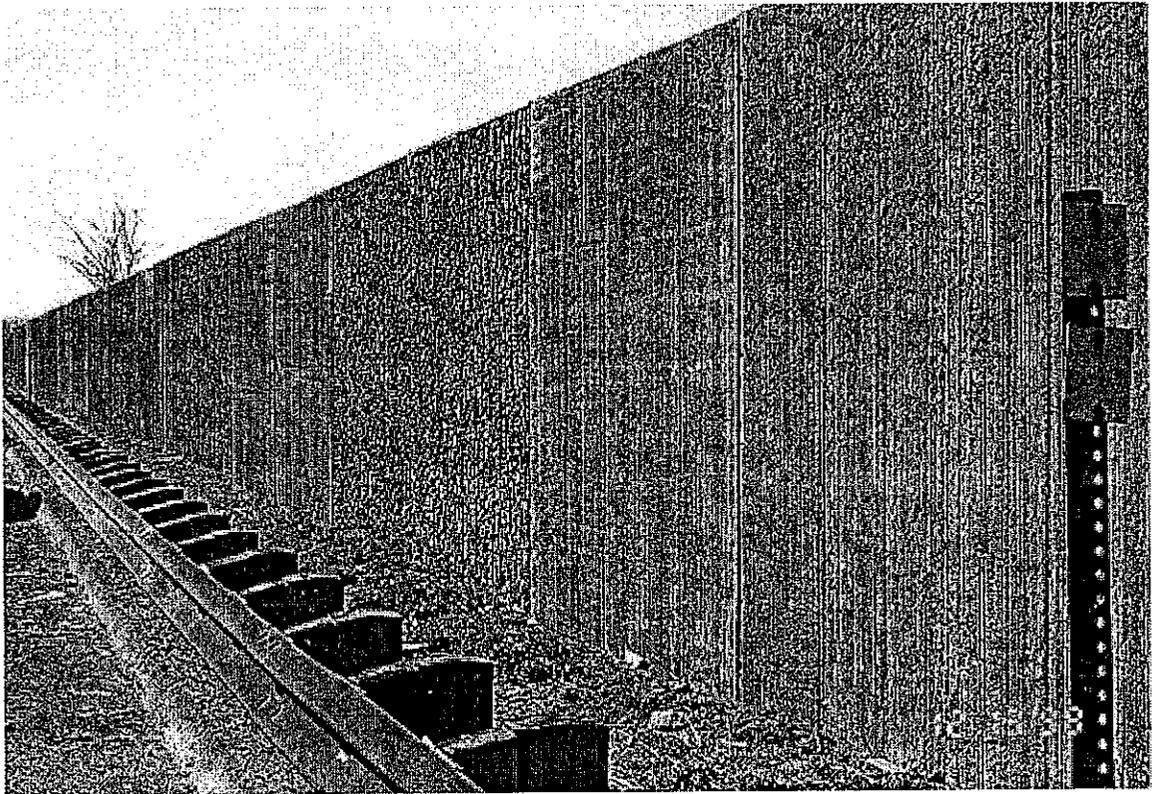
Precast/prestressed concrete, I-255, East St. Louis.
